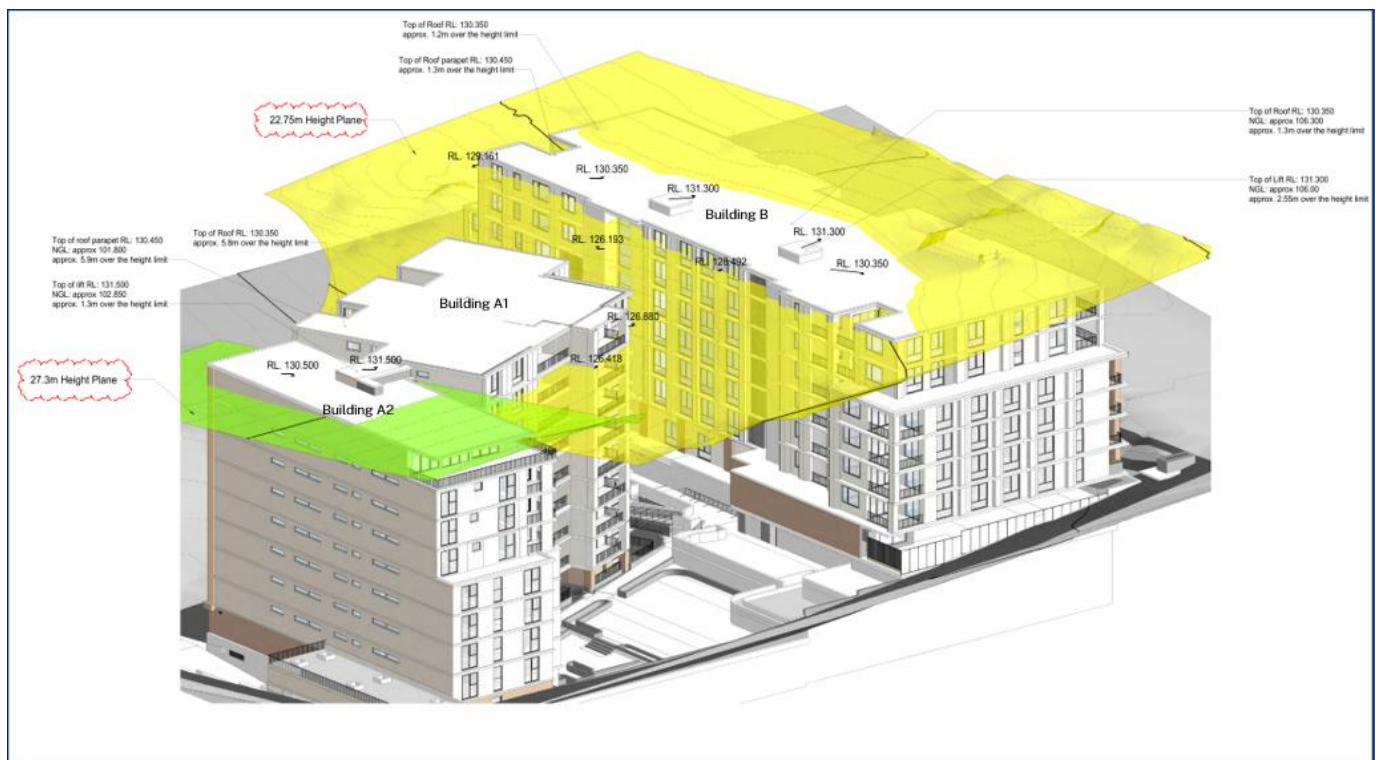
I Rooftop elements of Buildings A & B protruding above the maximum permissible height planes (Source: RtS)
